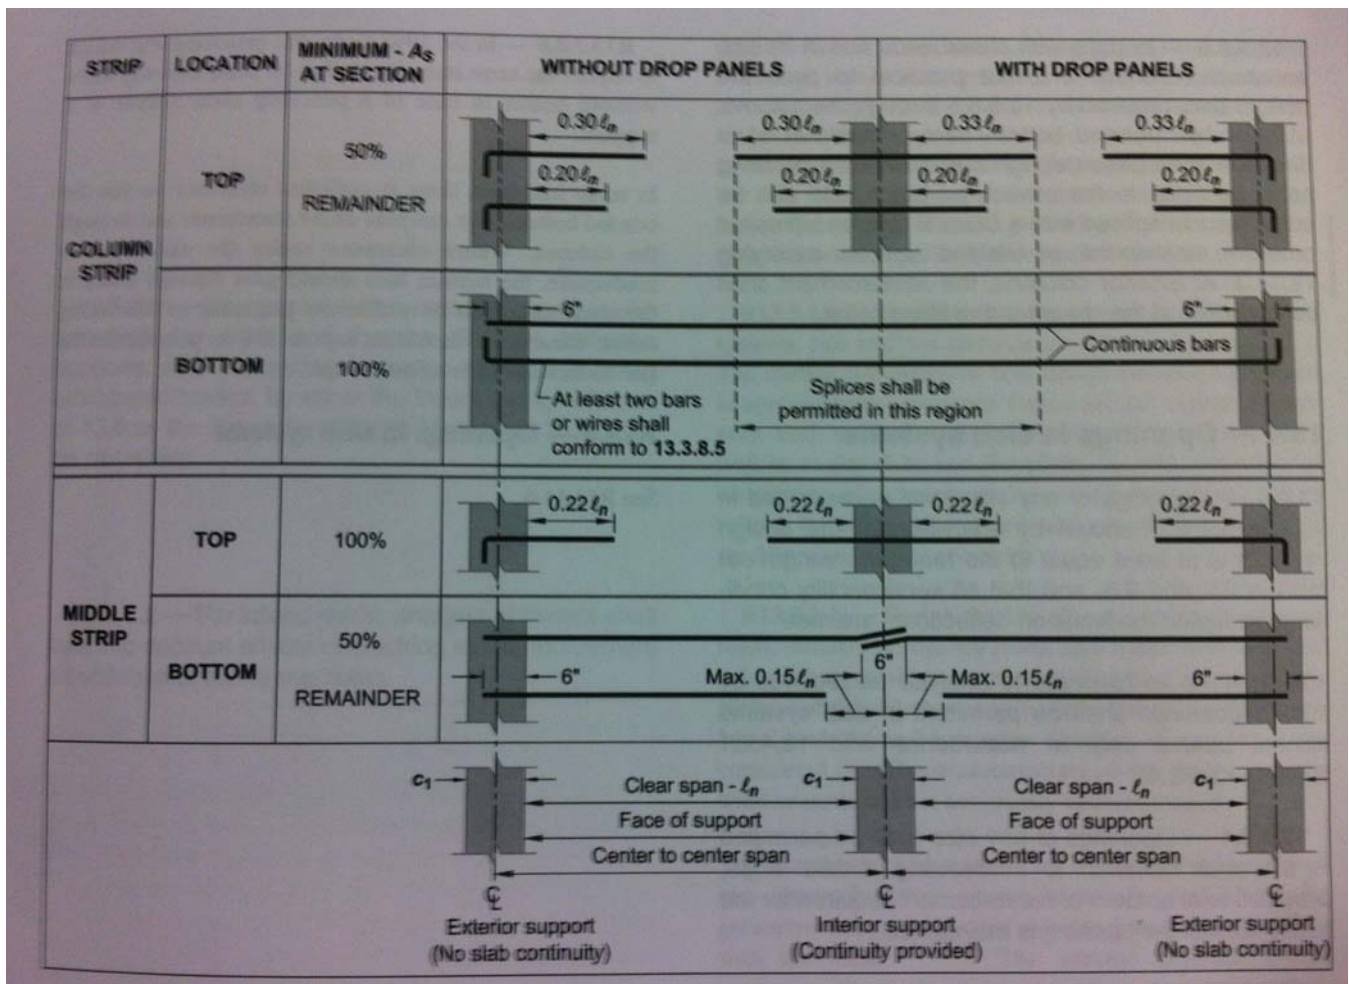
Figure 13.3.8 detailing slab rebar development length. Courtesy ACI 318-11.
